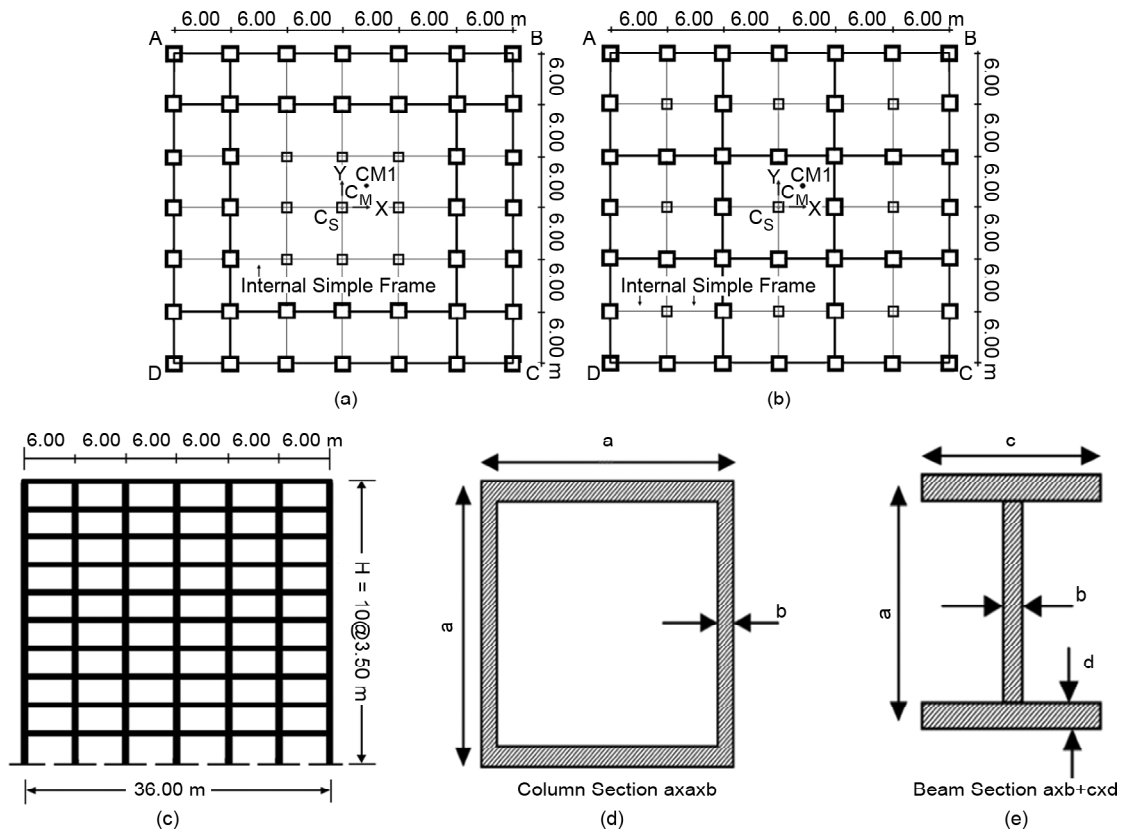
The studied structural models: (a) The framed tube skeleton; (b) The bundled tube skeleton; (c) Structural view (CM: the floor center of mass, CS: the story shear center); (d) Columns section property; (e) Beams section property.
